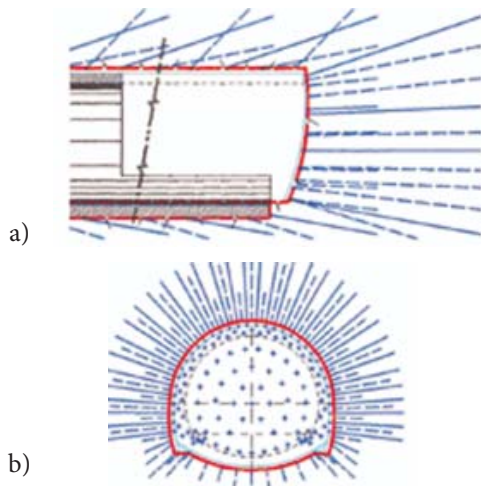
Typical scheme of a face-reinforcement intervention using longitudinal fibreglass elements: a) longitudinal section; b) transversal section [5]. A large number of elements, which are placed divergent from the tunnel axis, are often concentrated around the perimeter of the face to allow a crown of ground around the tunnel to be reinforced.
